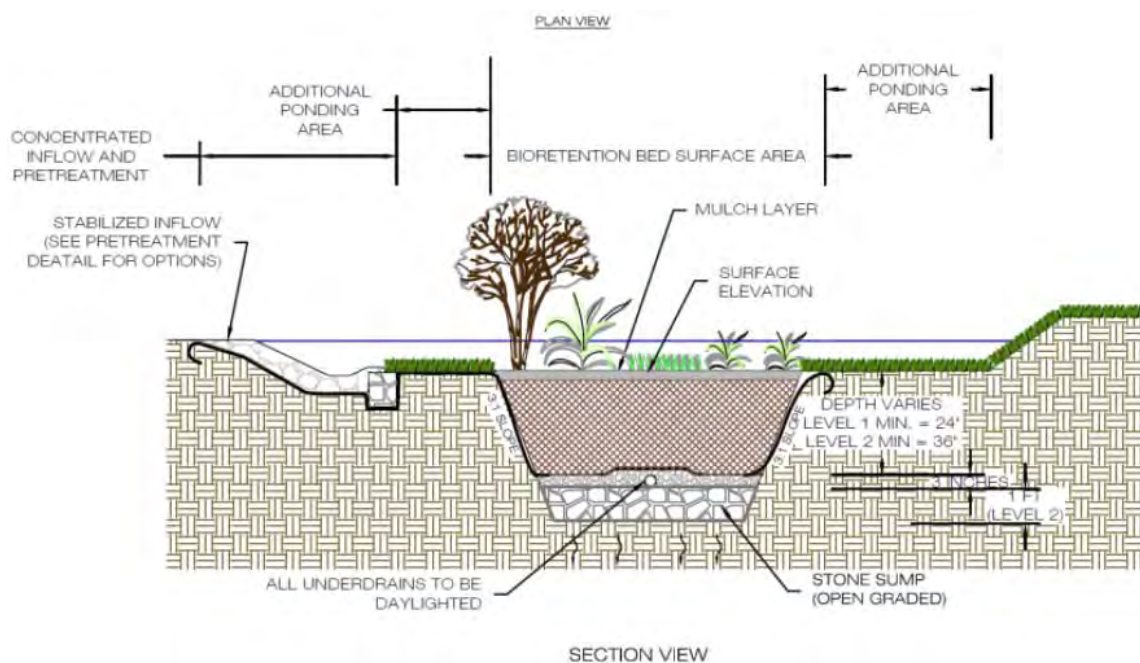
Typical Bioretention Detail with Additional Surface Ponding (Virginia DEQ 2011c)
